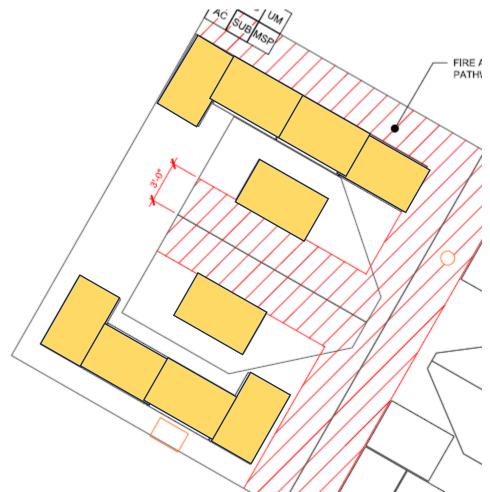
Detail of the propose solar panel arrangement on the street-facing roof side.
